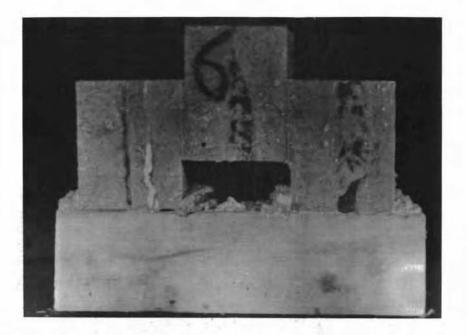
Welded shear test specimen, before test. See Table 15.
